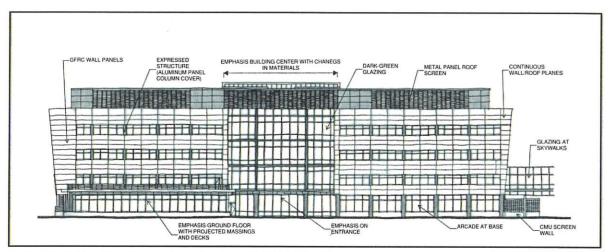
Building Façade examples - Elevation of NLB 1 at Gilead Campus
